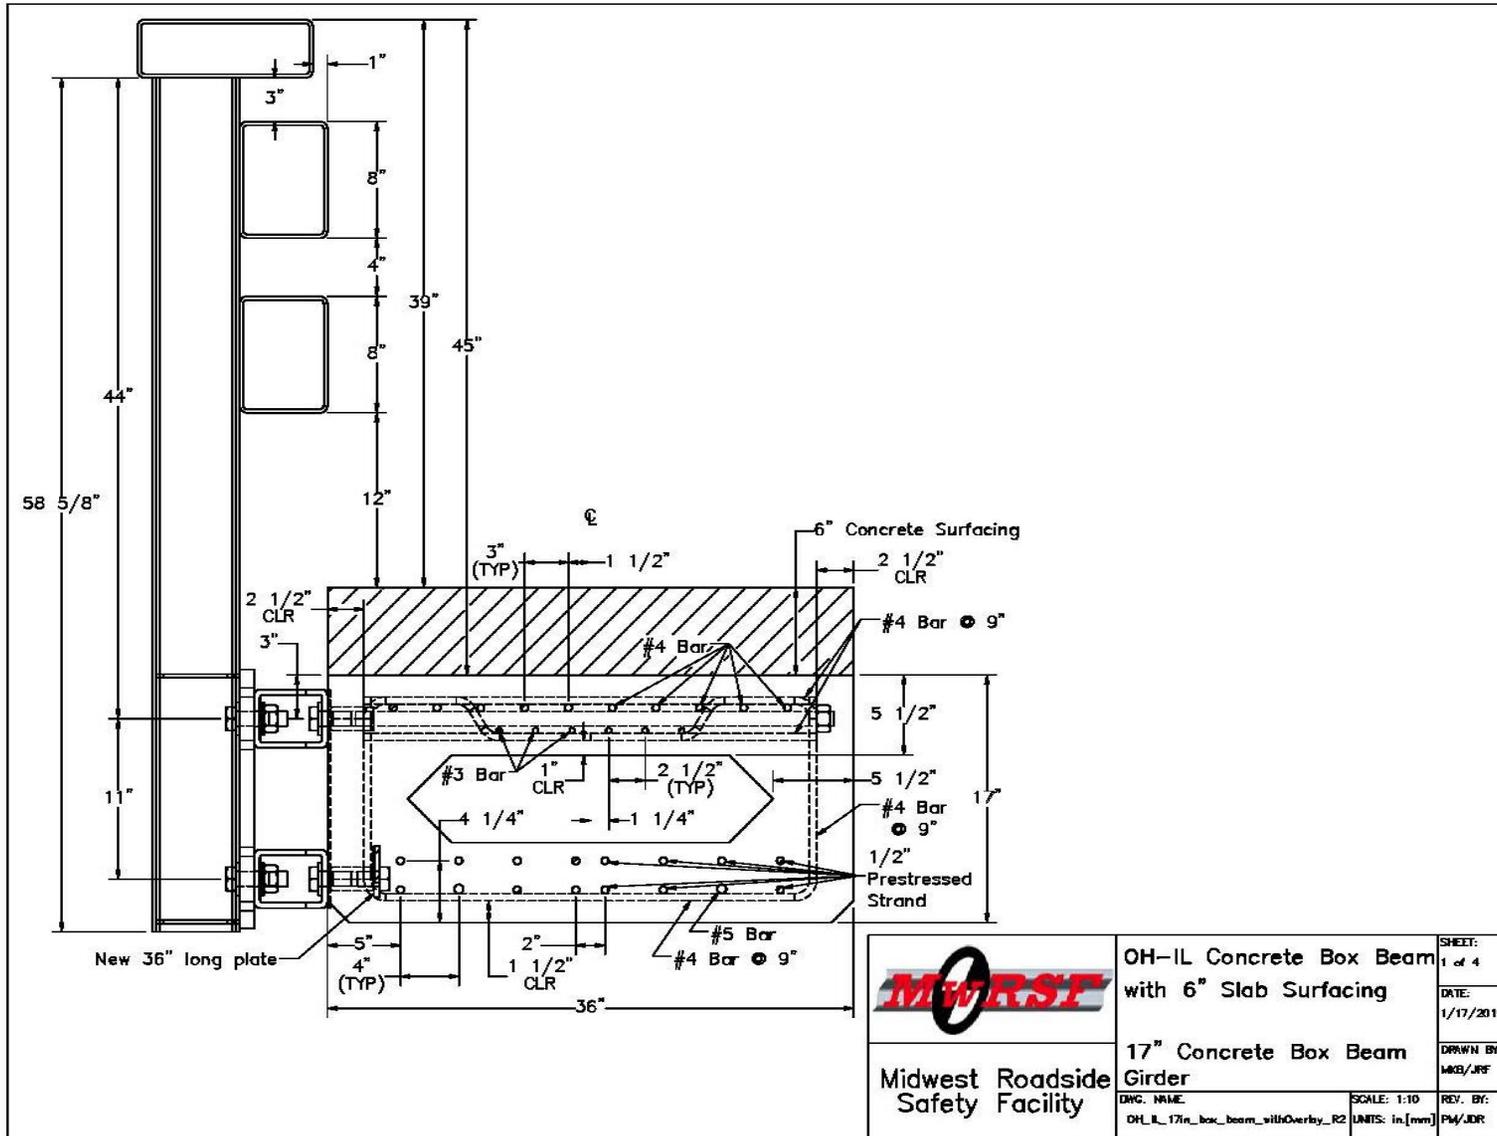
Typical 17-in. (432-mm) Deep Concrete Box-Beam Girder Configuration with Concrete Wearing Surface
